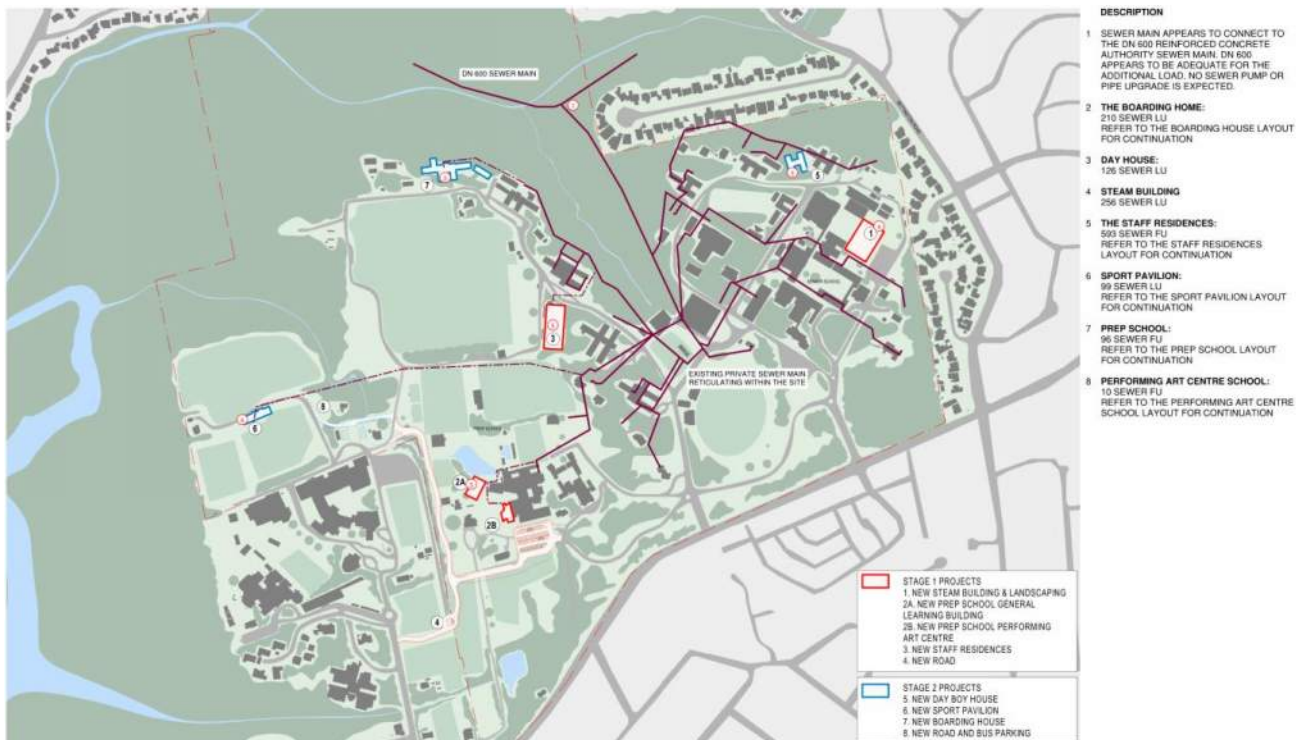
LOCATIONS OF THE NEW BUILDINGS AND THEIR ESTIMATE SEWER LOADS
